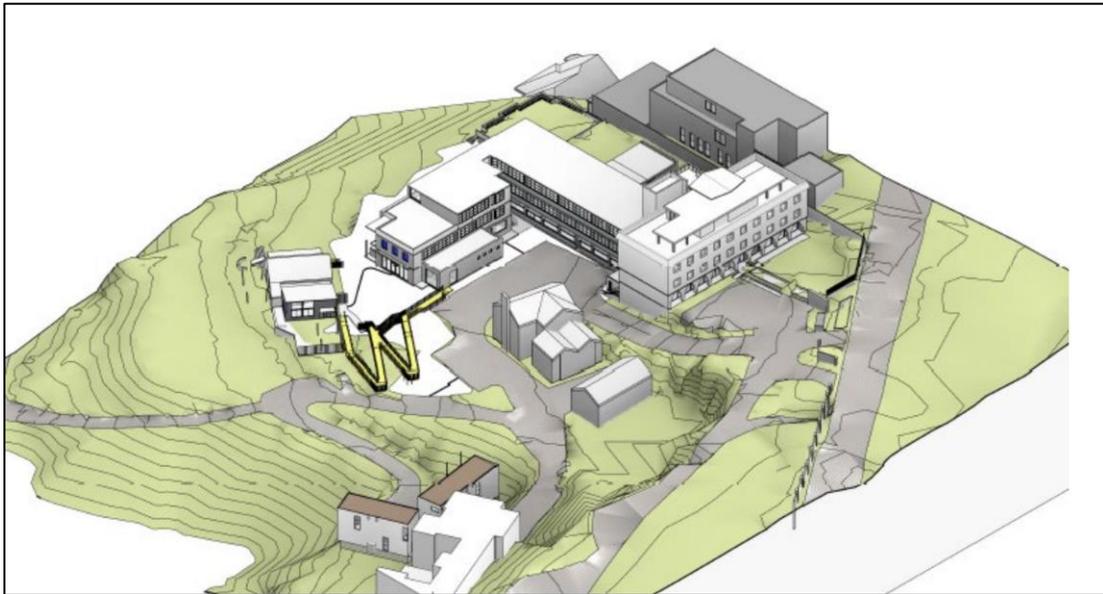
| Precinct A existing bulk and scale (Source: Applicant's RtS 2021)
